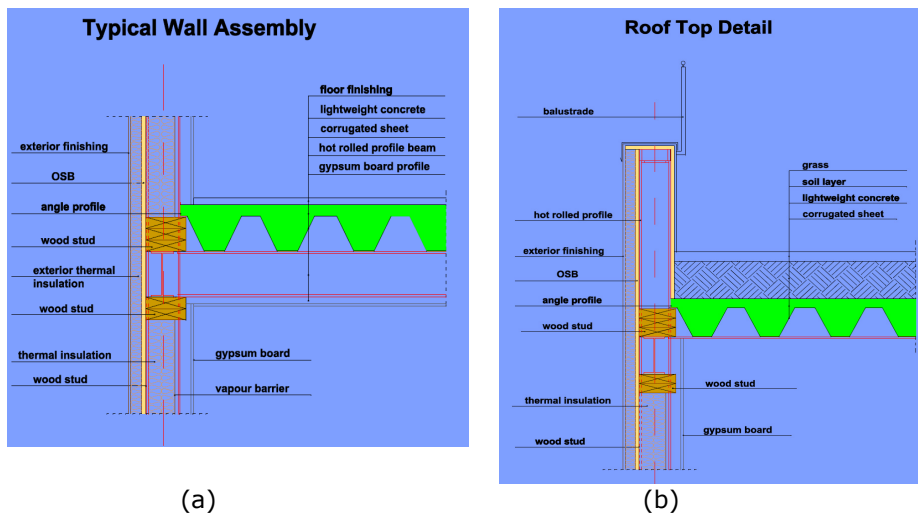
Affordable house, wall (a) and roof (b) detailing
